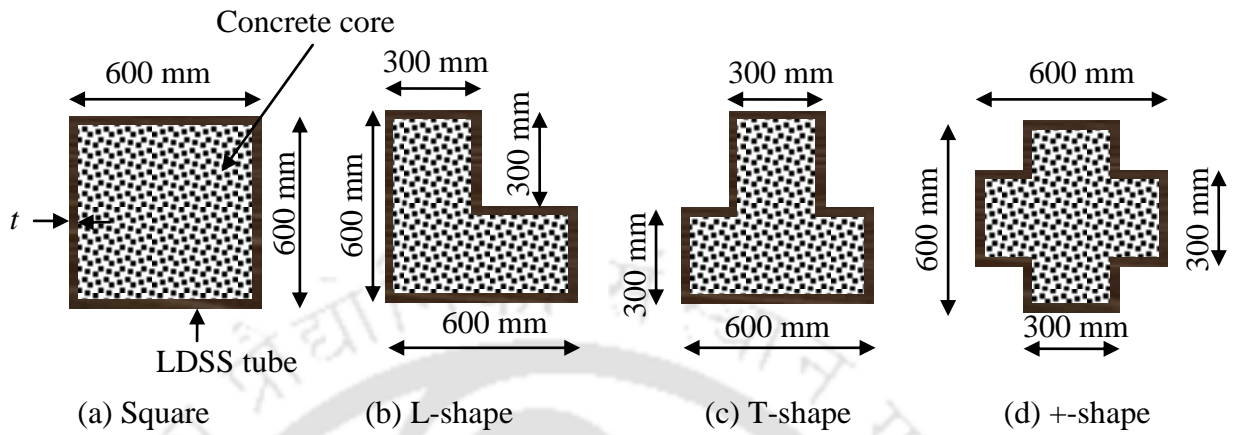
Numerical test specimens of CFDSST stub columns.
